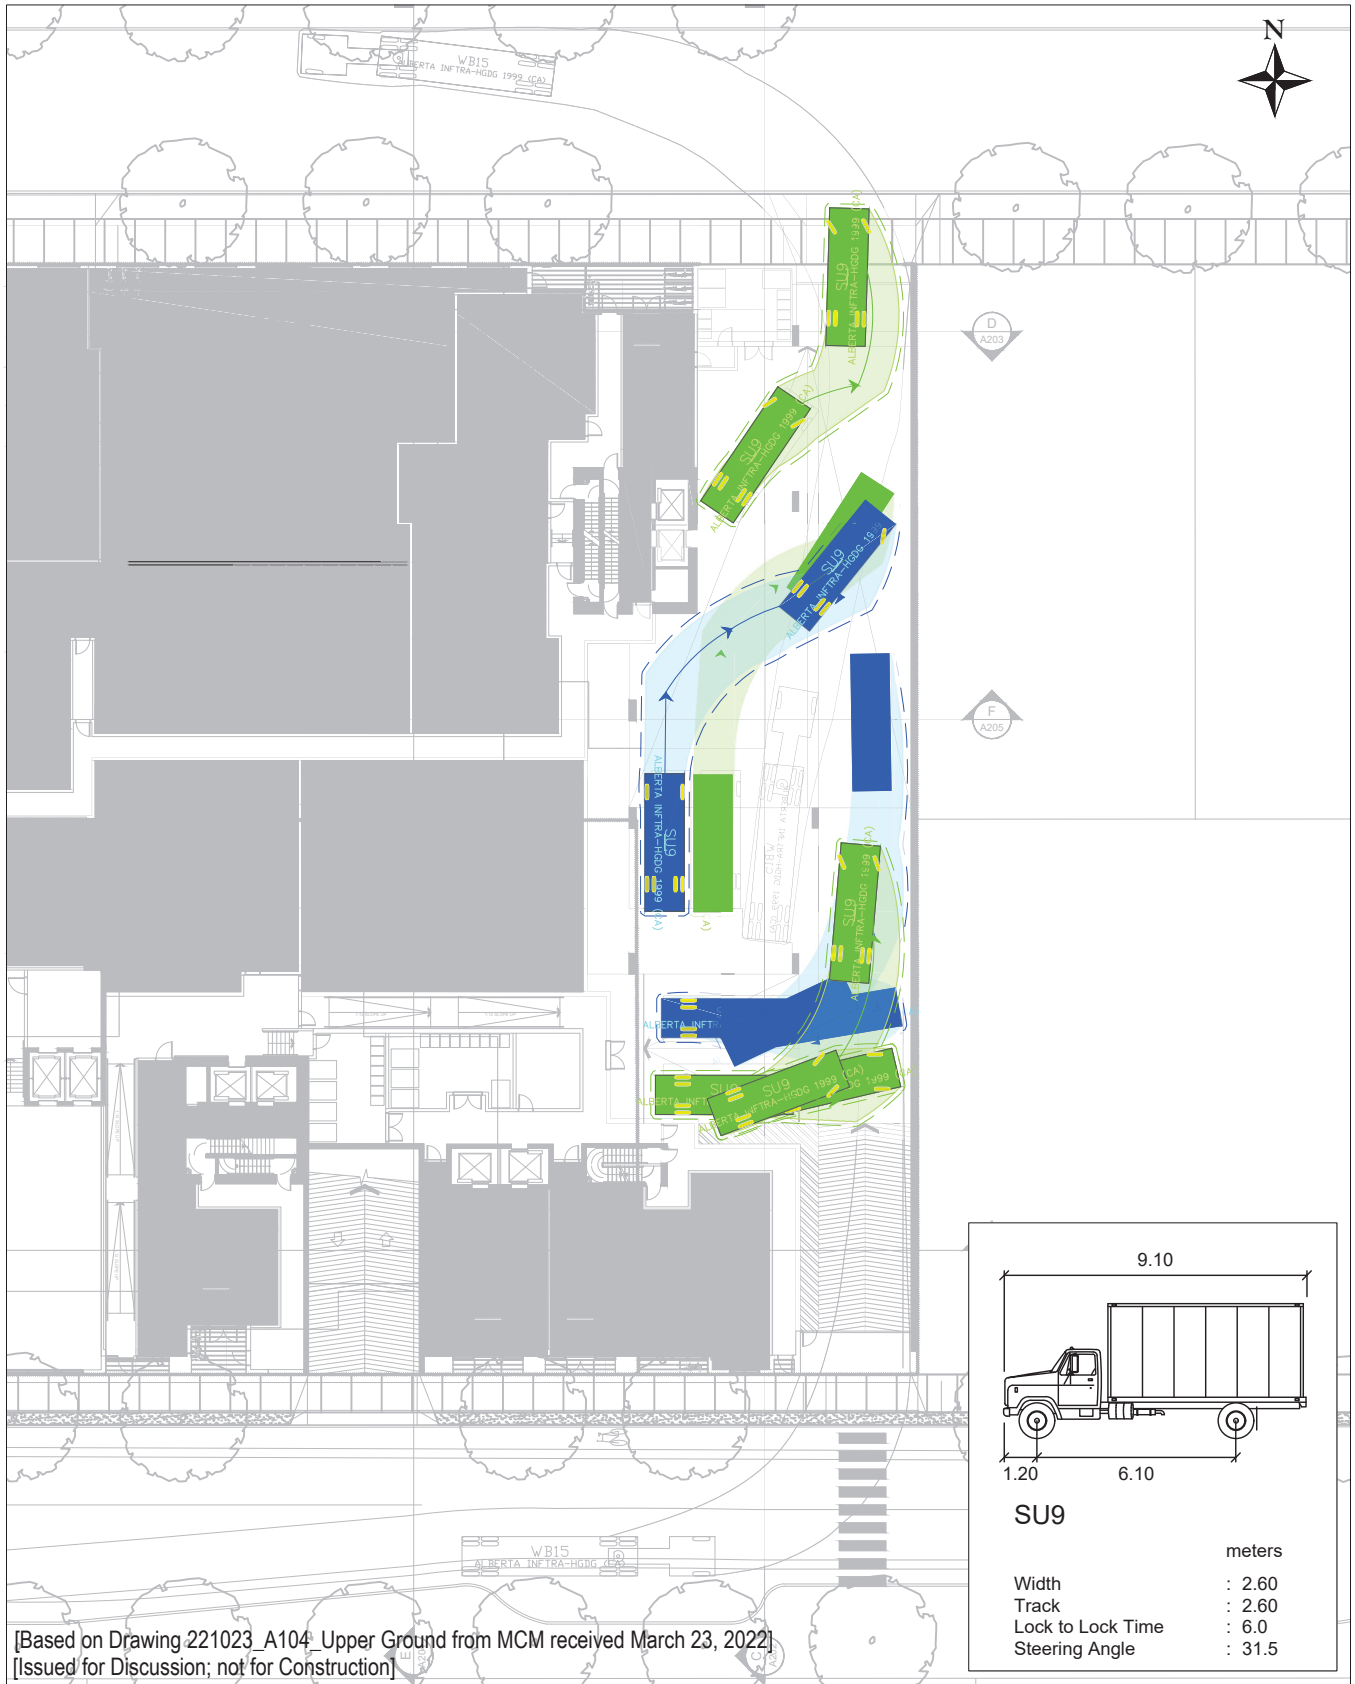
Laneway Loading - Class B Entry Movements
